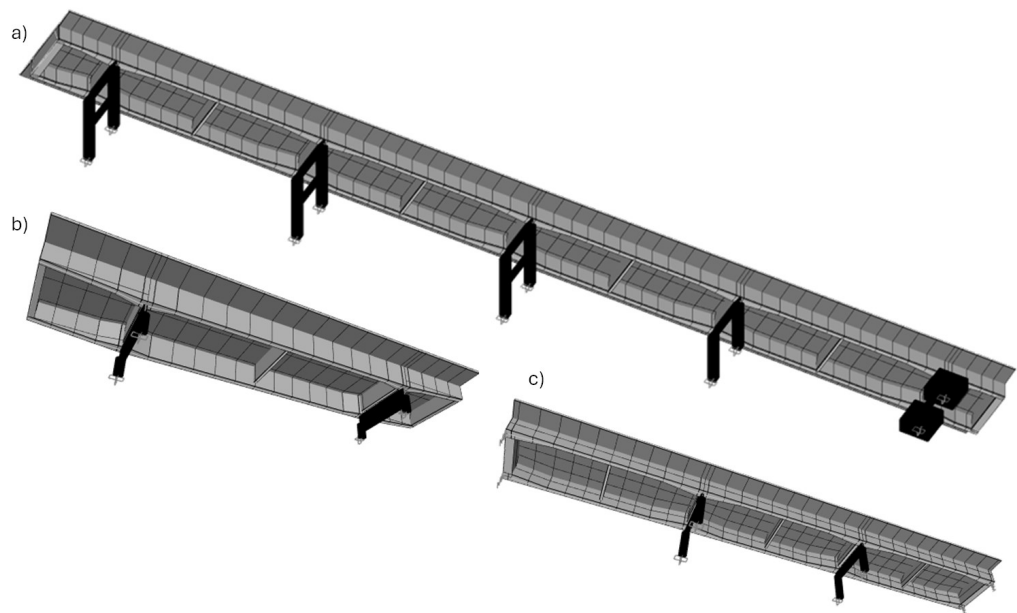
Finite Element Model on CSIBridge: a) Coimbra Viaduct I; b) Teixeira Stream Bridge; Pirapetinga River Bridge.
